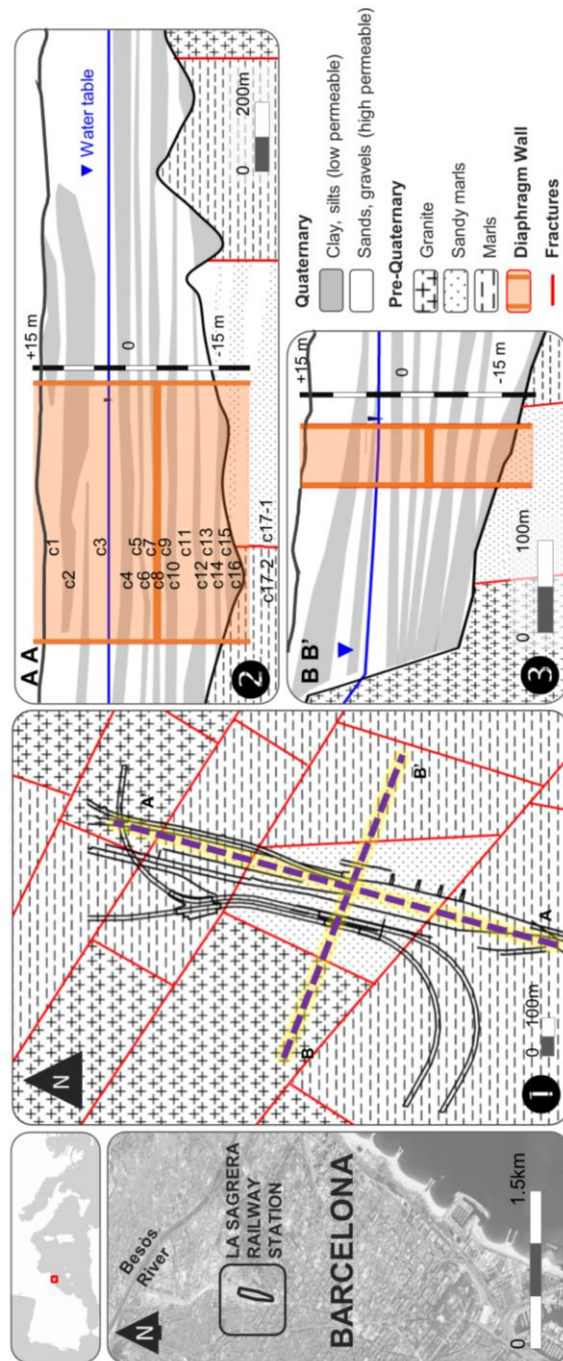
Geographical location of the study site and detailed geological profile of the site. (1) Plan view of the geological basement, (2) Cross section A-B, (3) Cross section C-D. Excavation area, limited by diaphragm walls, is shown in light brown color. Both cross sections show the maximum excavation and the required dewatering system.
